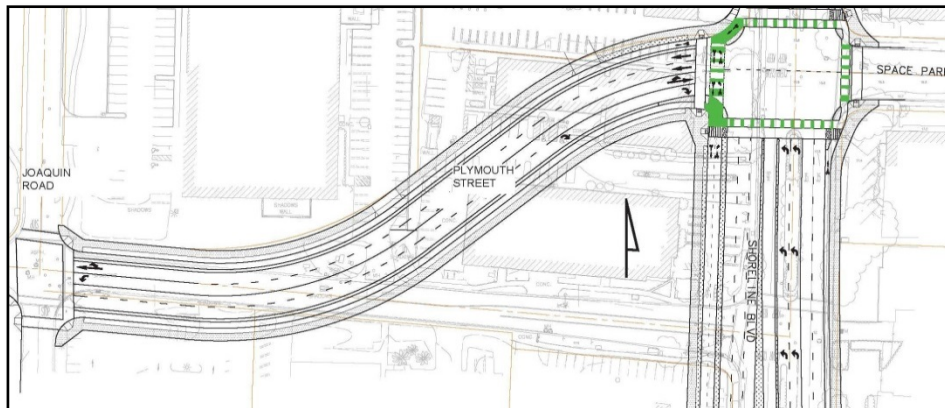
Plymouth Street-Space Park Way Realignment Improvements
